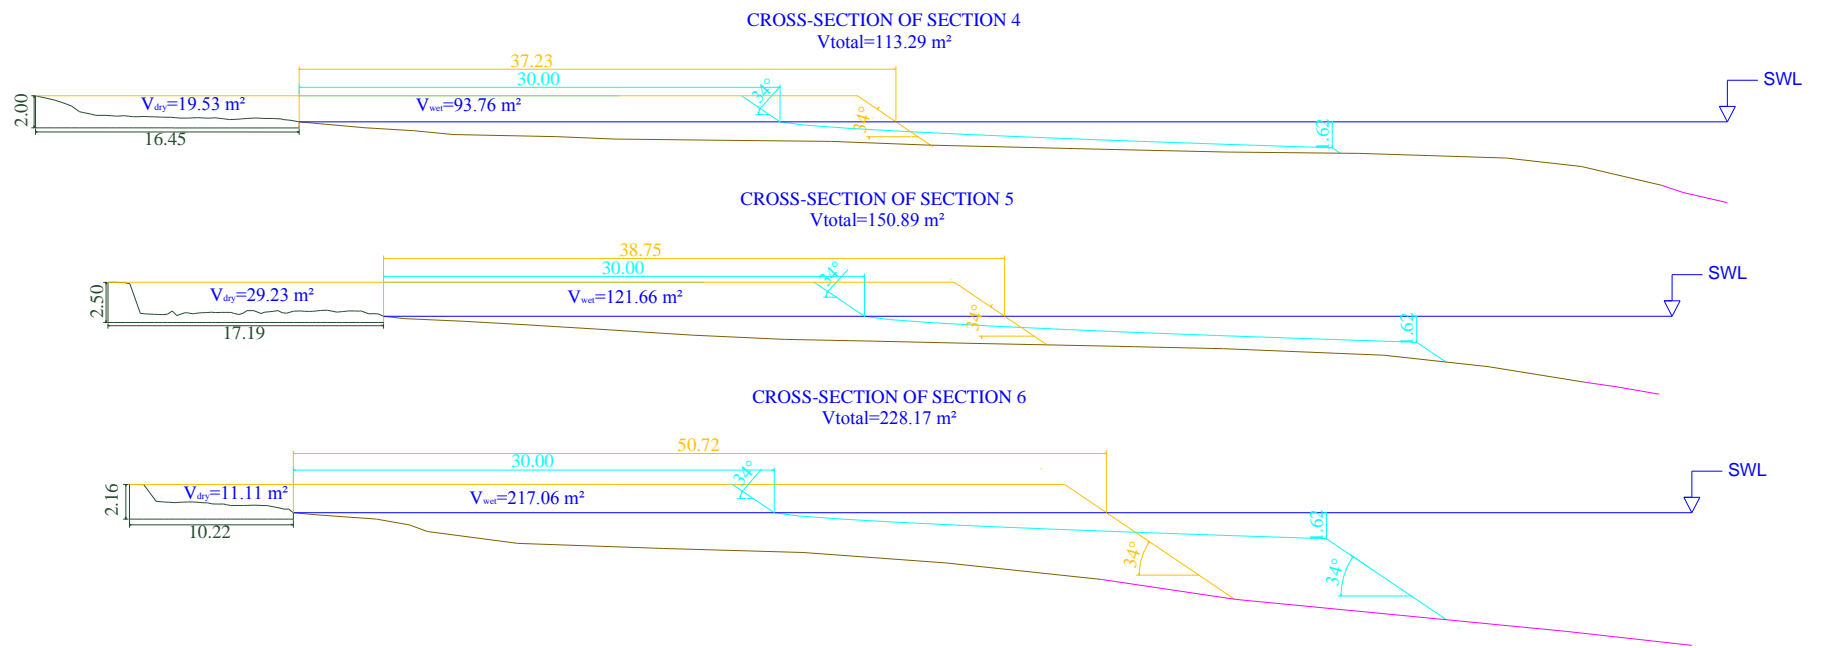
Design profiles of Section 4,5 and 6 for 30 m new dry beach width ($D_{\text{fill}}=0.45 \text{ mm}$).
